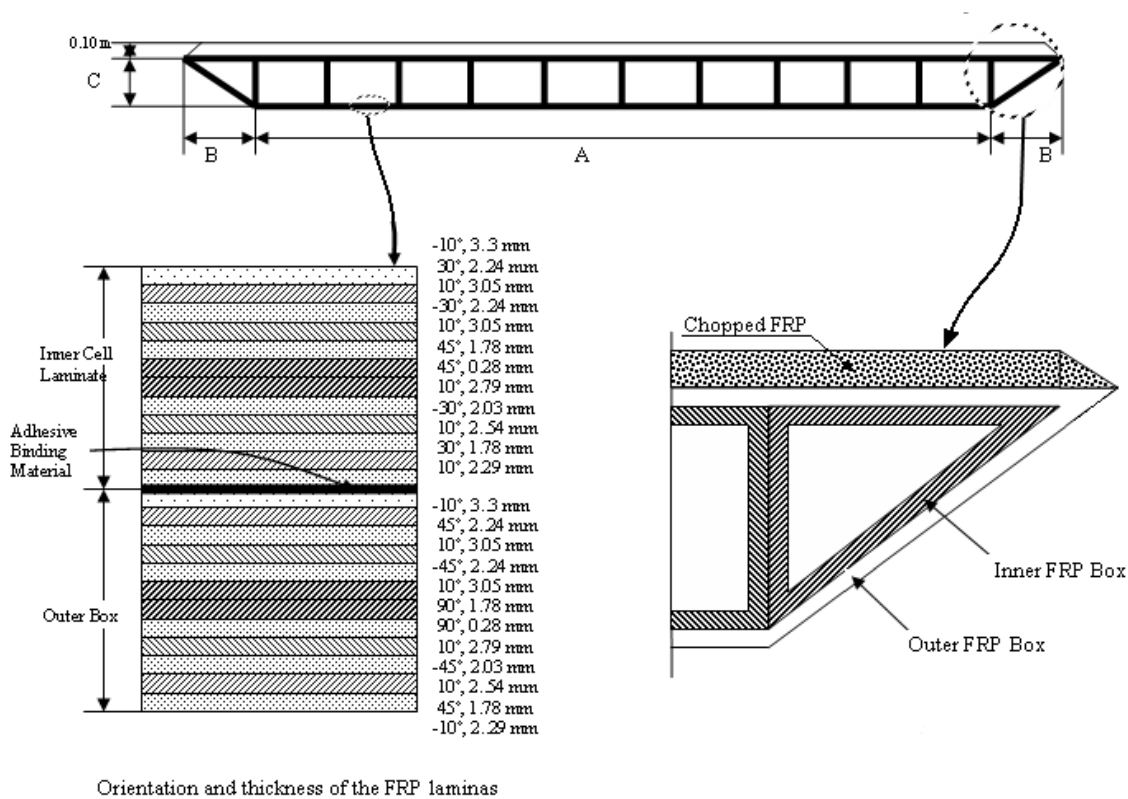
Plate orientated box-girder FRP deck system (Almansour et al. 2010)
